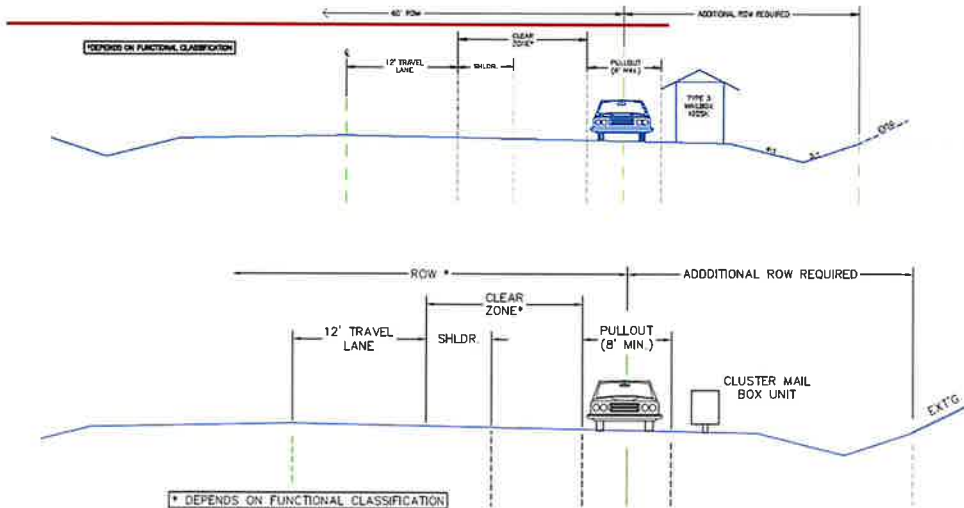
Mailbox Pad Pull-Off-out Area Detail, Urban Application
